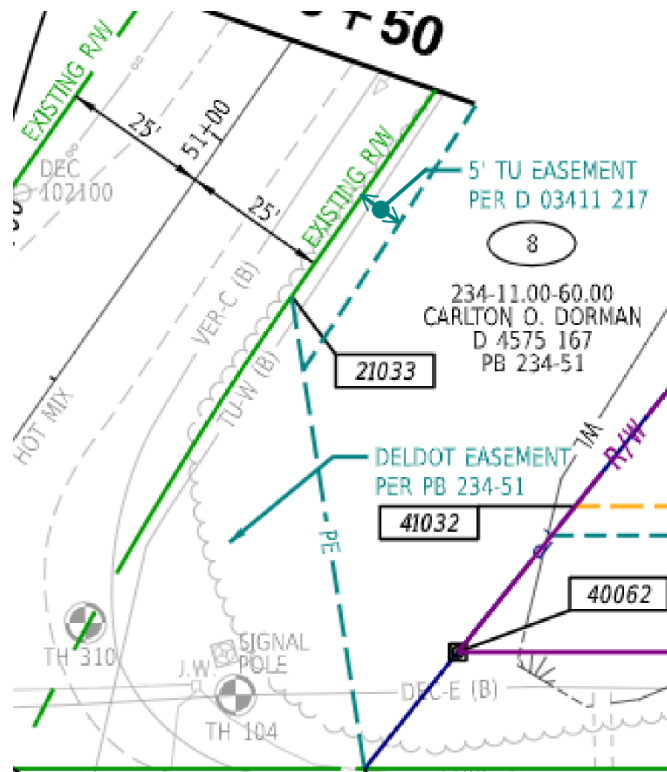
Example of existing DelDOT and existing Tidewater Utility (TU) Easement labels
